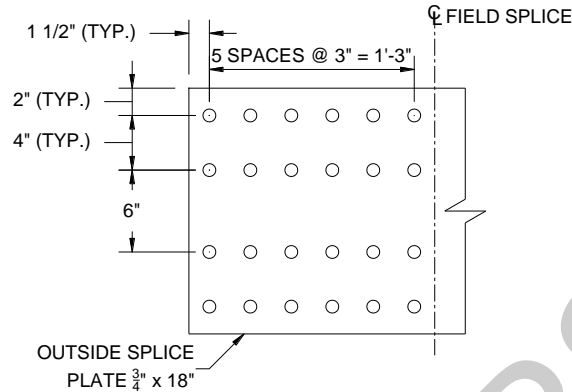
Outside Bottom Flange Splice Plate – Plan View
